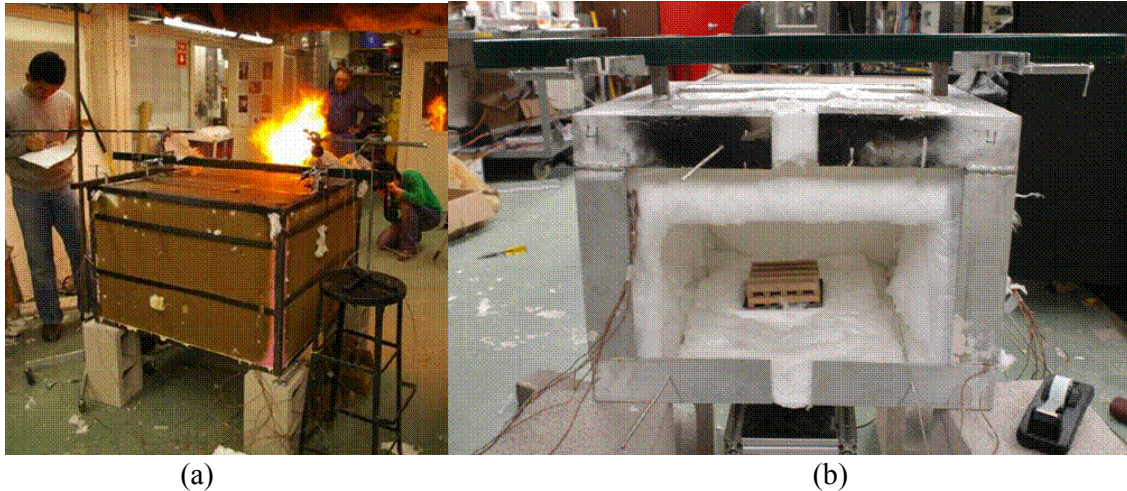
(a) 1/4-scale frame fire testing (b) 1/8-scale frame fire testing
